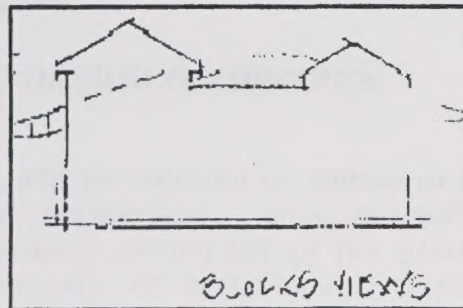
Views can be blocked if building design is not considered with respect to the view.
